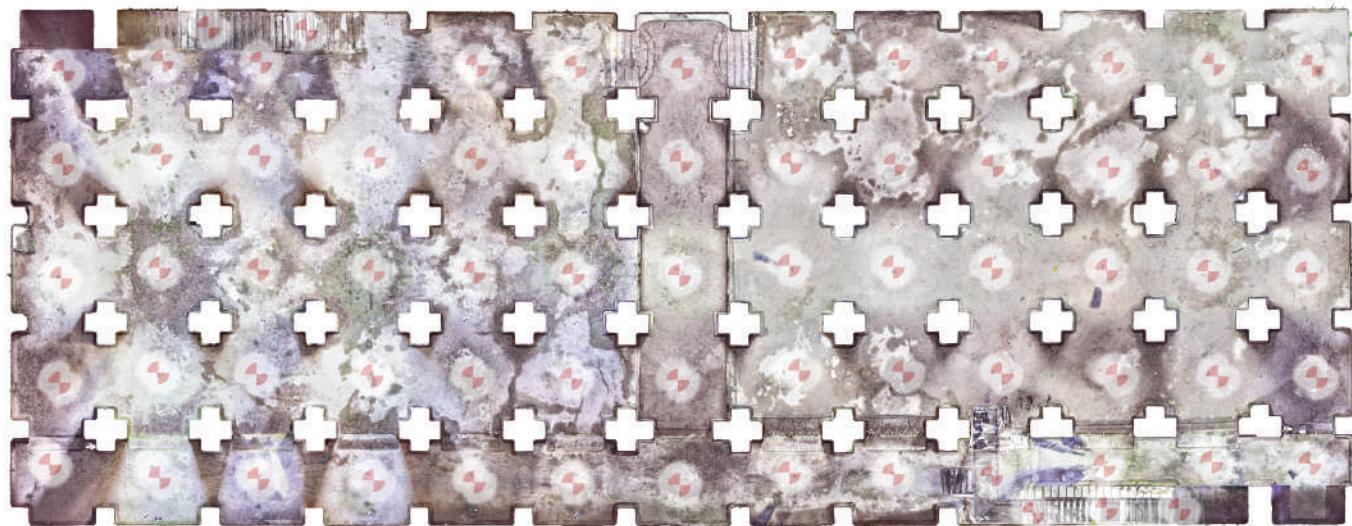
Floor plan extracted from the point cloud processed, with the interior TLS stations.
